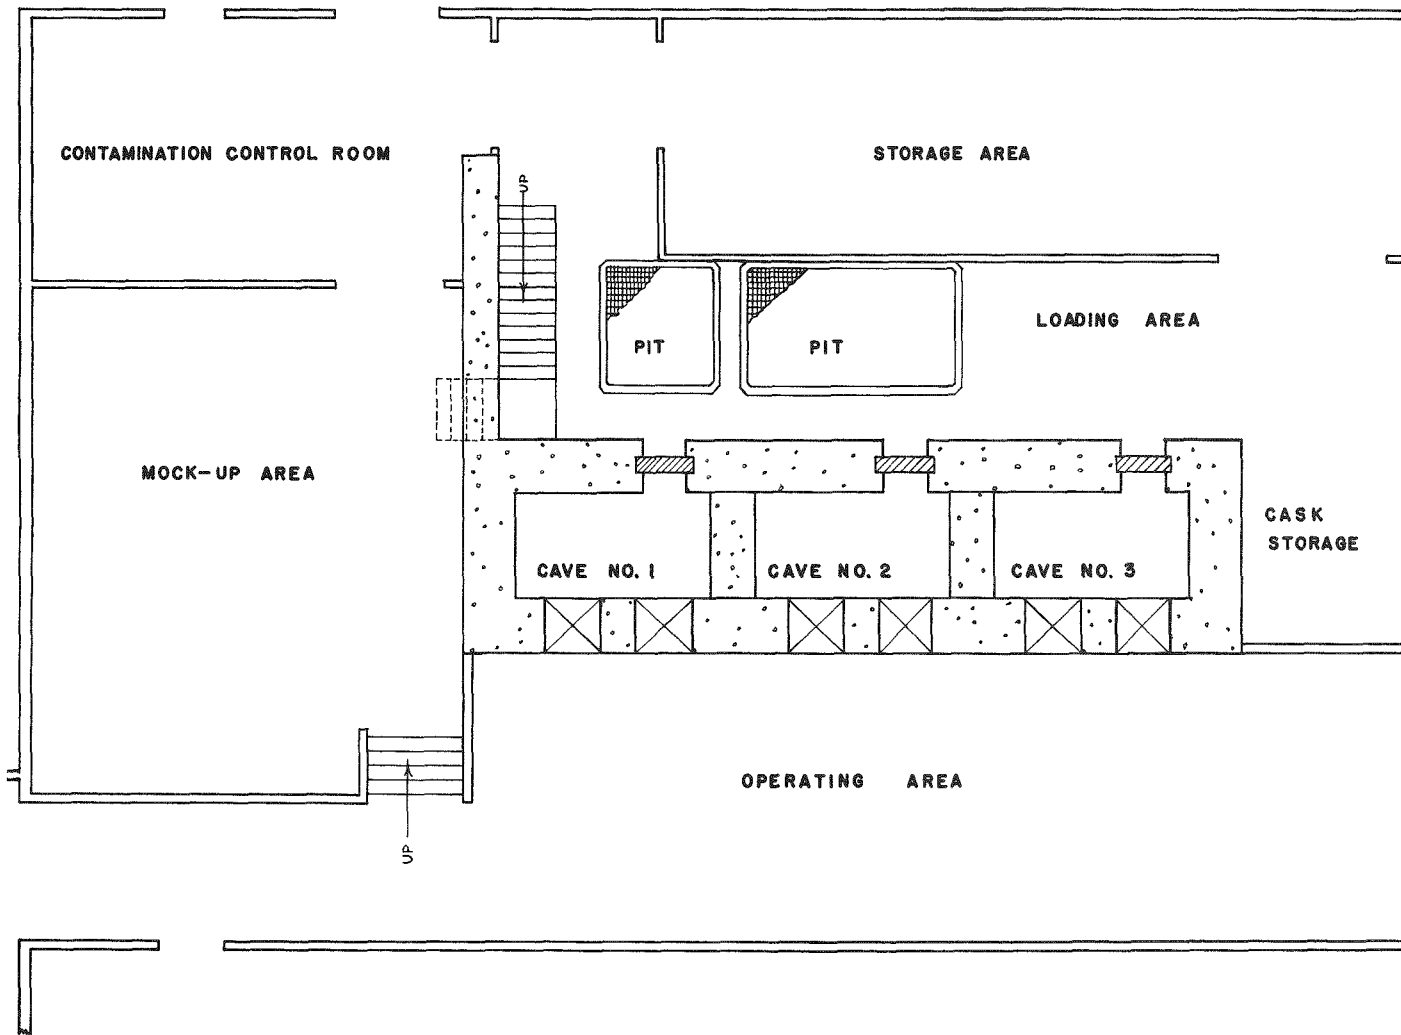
First-floor plan of hot-cell building, Main Technical Laboratory, building 773-A, Savannah River.
